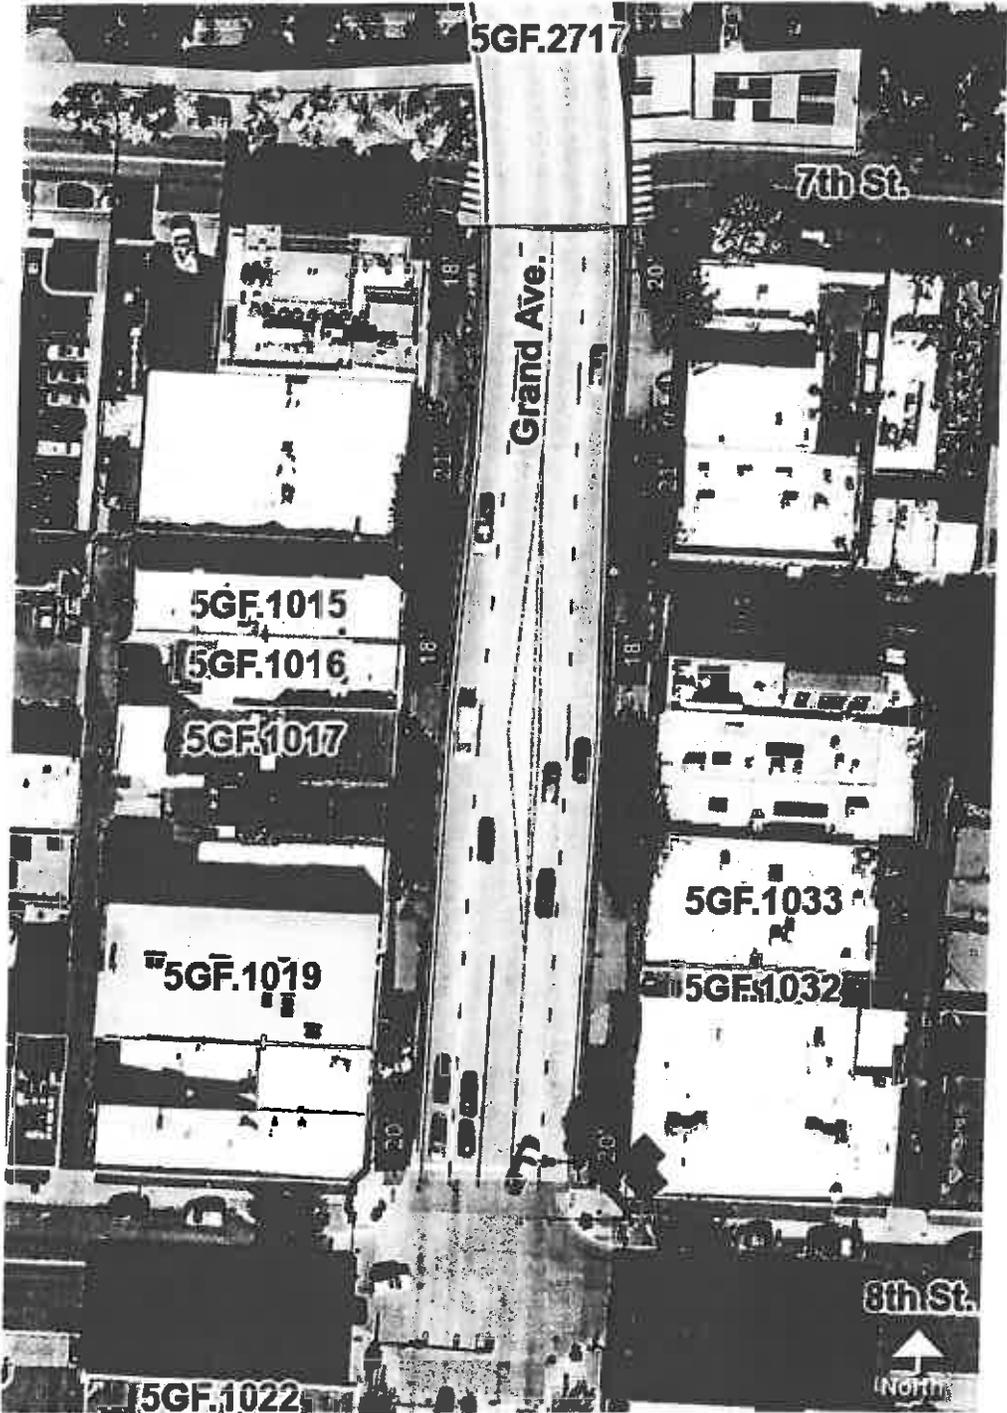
Existing Grand Avenue between 7<sup>th</sup> Street and 8<sup>th</sup> Street, Illustrates existing bridge/roadway width and distance from adjacent buildings
